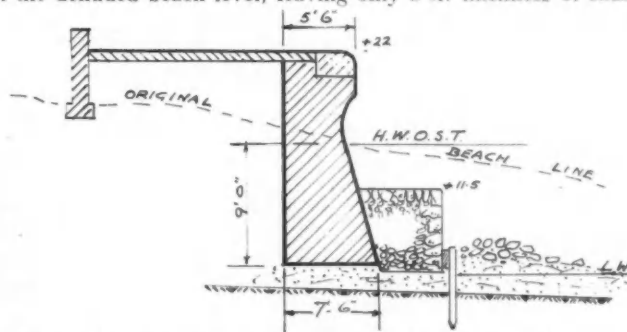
Cross section of Bray sea-wall, showing protective apron at toe of original wall.
